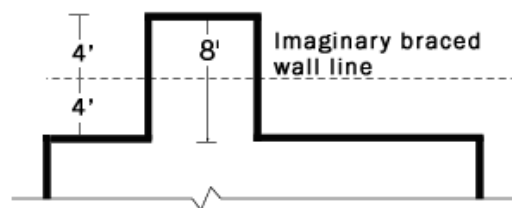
BRACED WALL LINES OF A SIMPLE HOUSE
